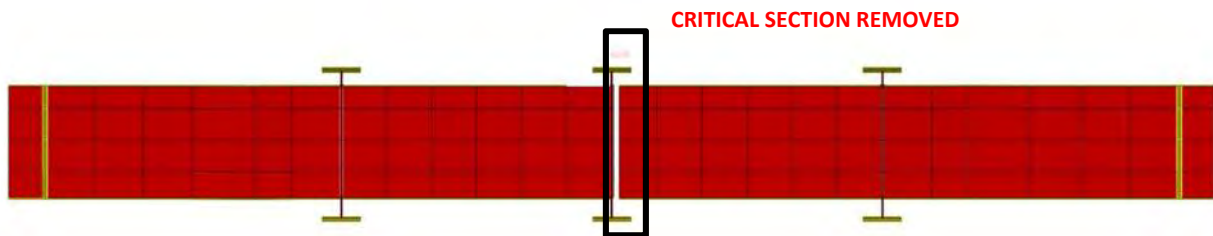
Location of Fracture in Damaged Condition at Straddle Bent Pier Cap
